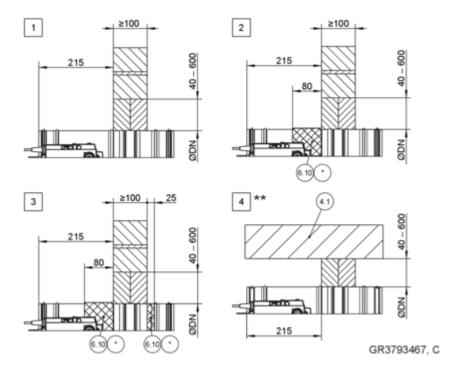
Dry mortarless installation with fire batt into a solid wall
